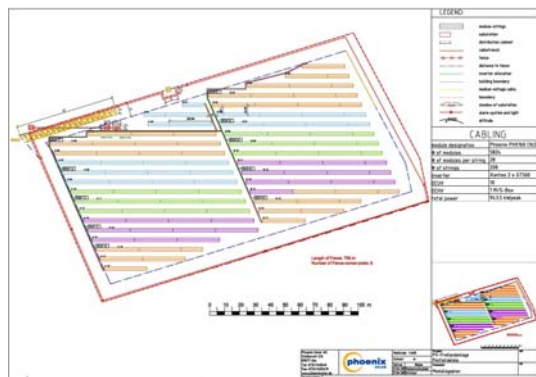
General layout of the 1MWp PV plant at Pontoiraklia
